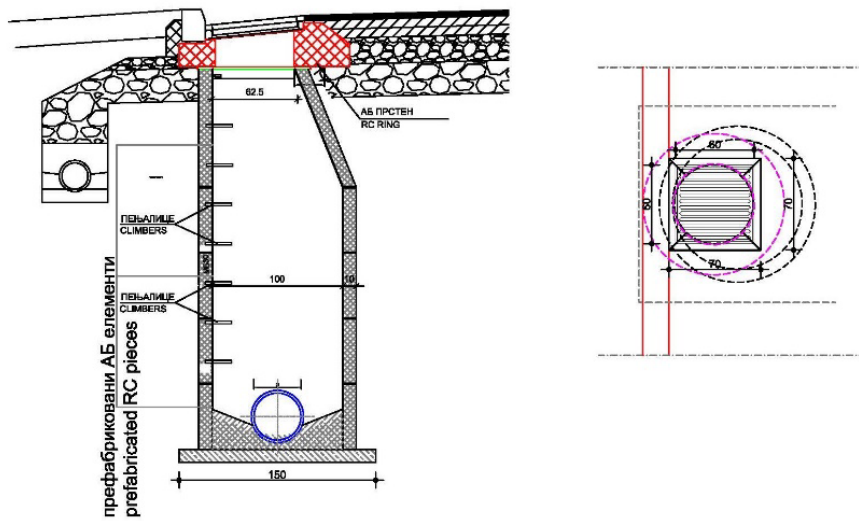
Prefabricated manhole-gully for pipes DN300-400-500-600
